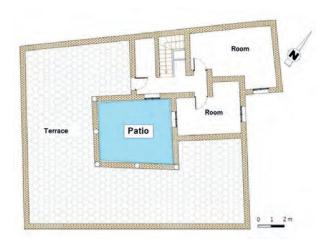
First floor plan of an ottoman house located in Bab El Hadid. (source: the authors).
